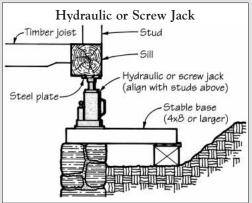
Figure B. To jack up the sill in post-and-beam construction, set a screw or hydraulic jack on a large, solidly shimmed plank placed at right angles to the sill.
